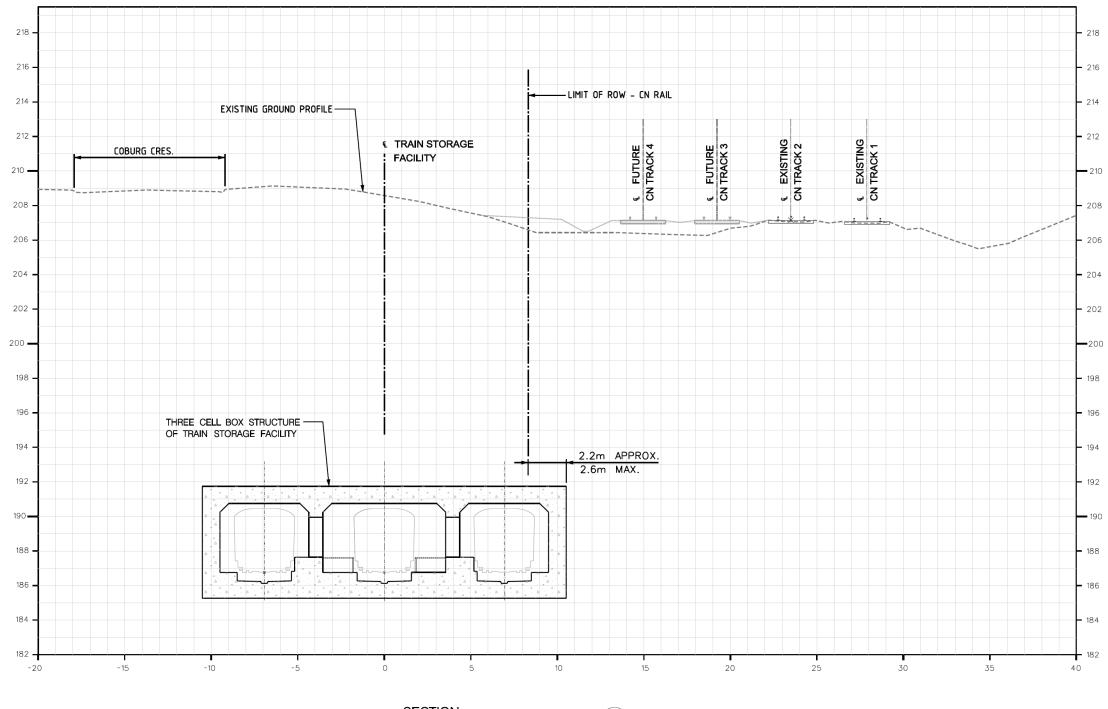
Proposed Train Storage Facility (Alignment Bi, Typical Cross Section)
